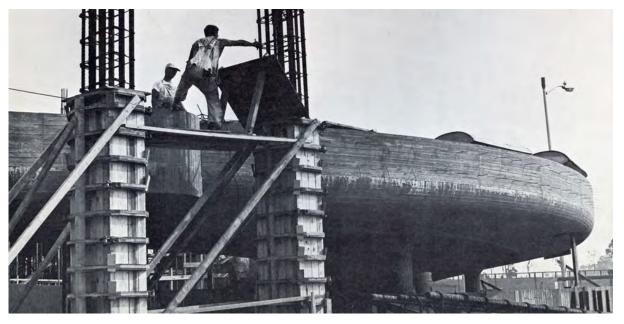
Southwest view of construction; camera facing east at the southwest entry ramp. Photograph: New Haven Redevelopment collection, New Haven Museum.
